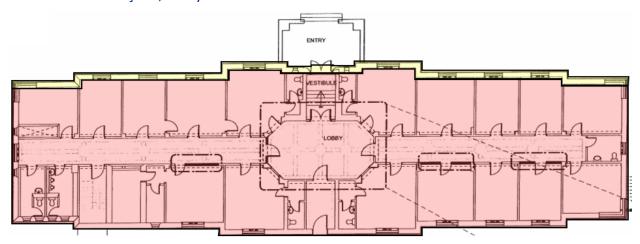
Diagram showing retained sections of the building for Option 5 'façade retention of only the building's primary, north elevation'
